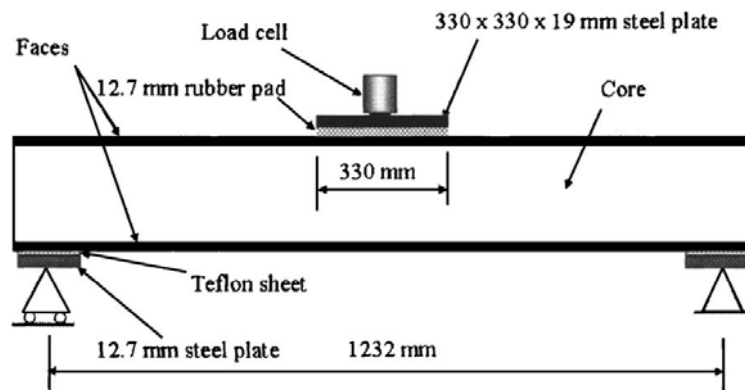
Test set-up for Kansas beams performed by (Camata & Shing, 2005)
